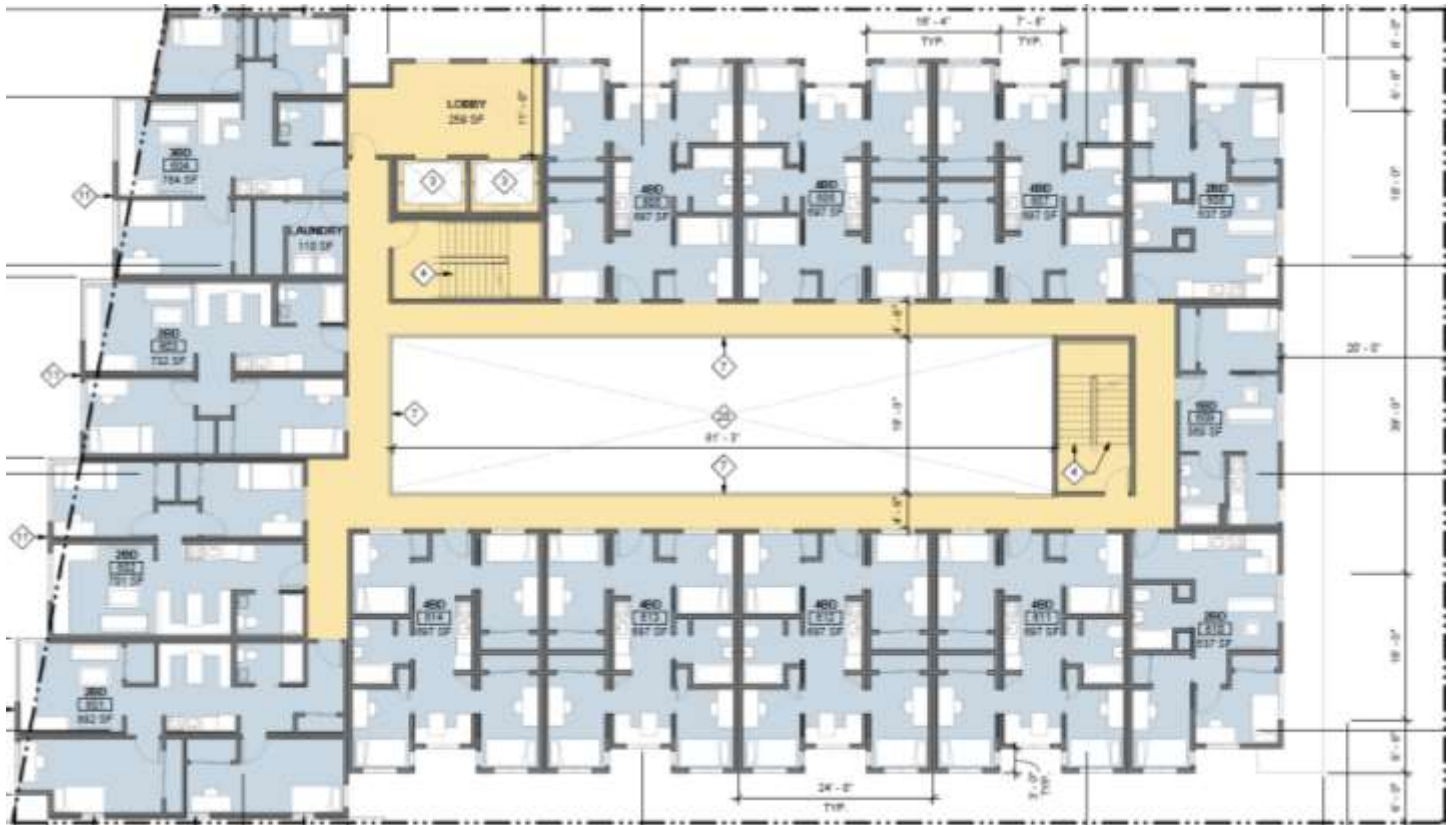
Floor Plan, Floors 5 - 6 December 2015
